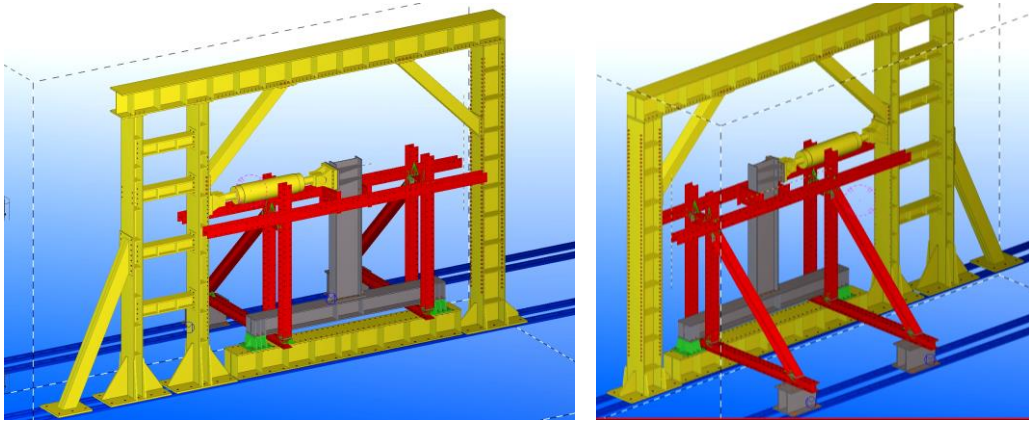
Beam-to-column joint specimen 3D Model
